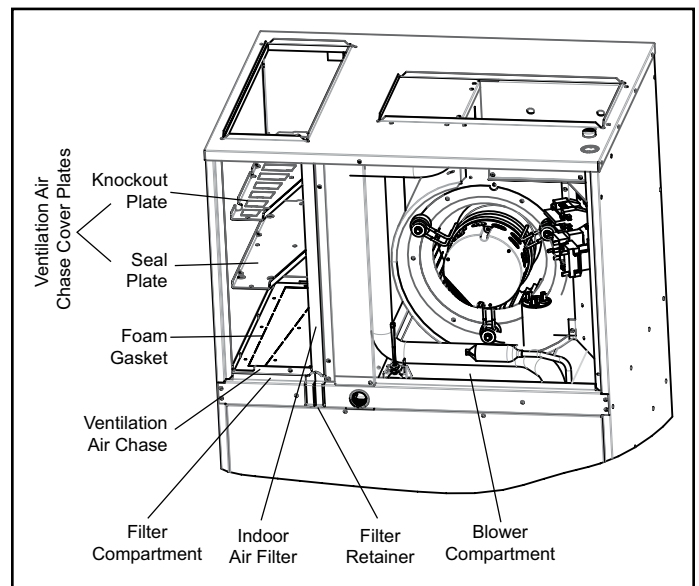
Access Panel & Ventilation Chase Cover Plate Removal
